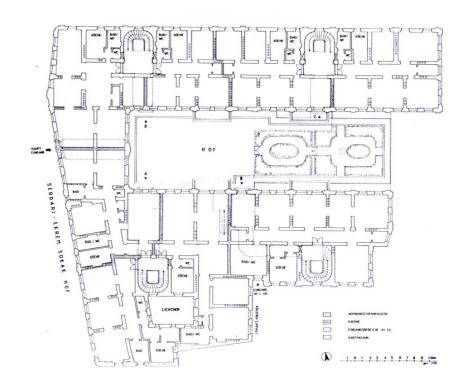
a. *Doğan Apartmanı*, typical floor plan, İstanbul
